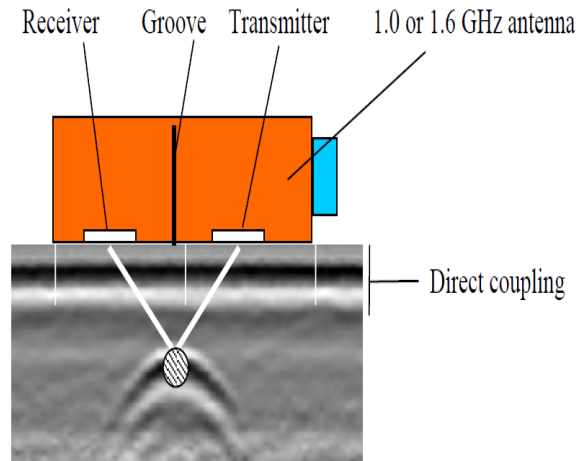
Ground Coupled GPR signals from steel in concrete (GSSI).
